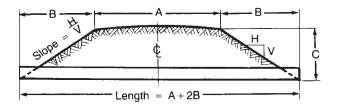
Computation of culvert length when flow line is on flat grade.
